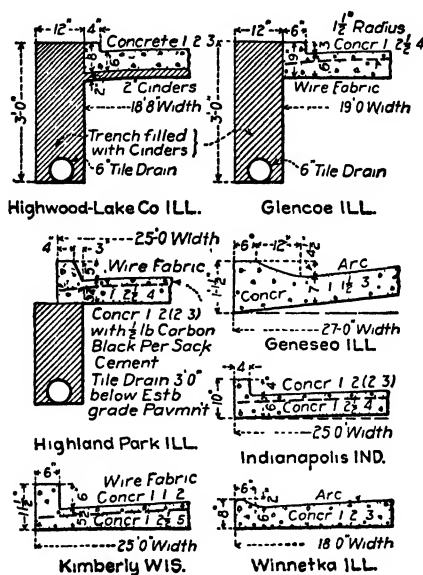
Cross-sections for integral curbs on concrete pavements.
